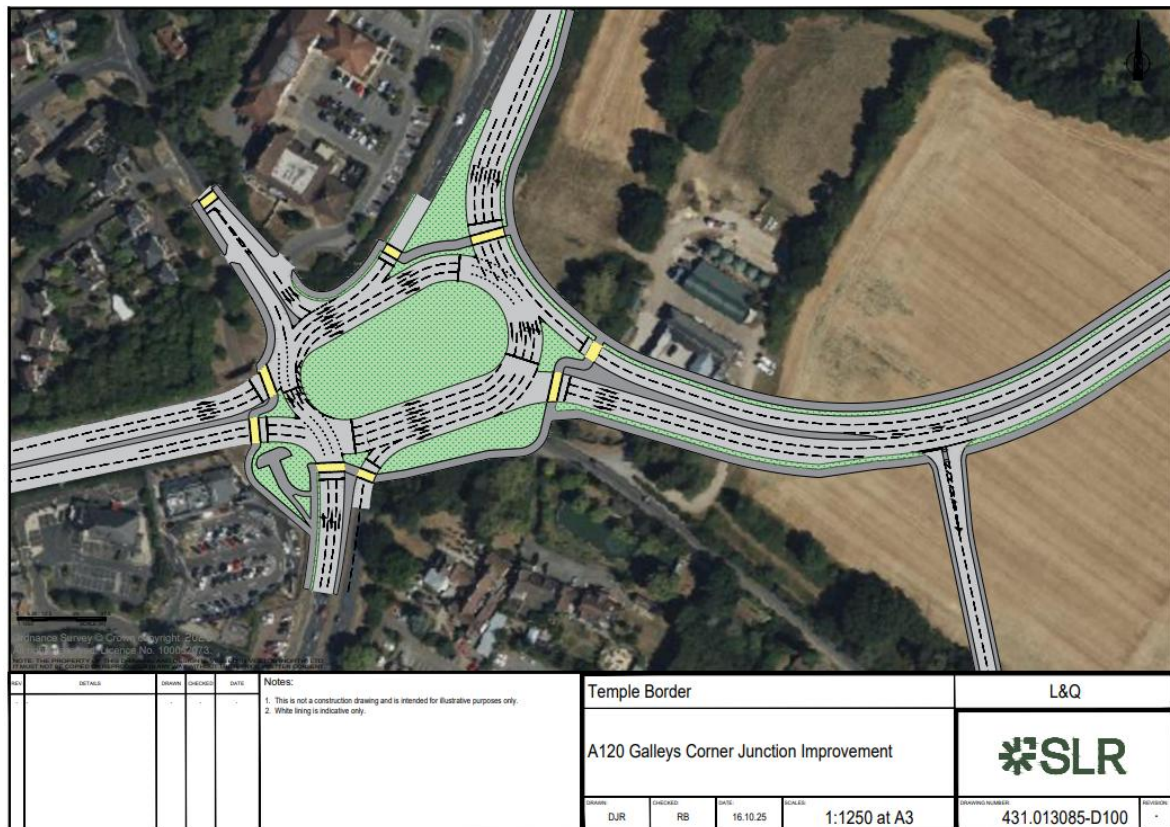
Galleys Corner Roundabout Developer Proposals (Source: SLR Consulting)
